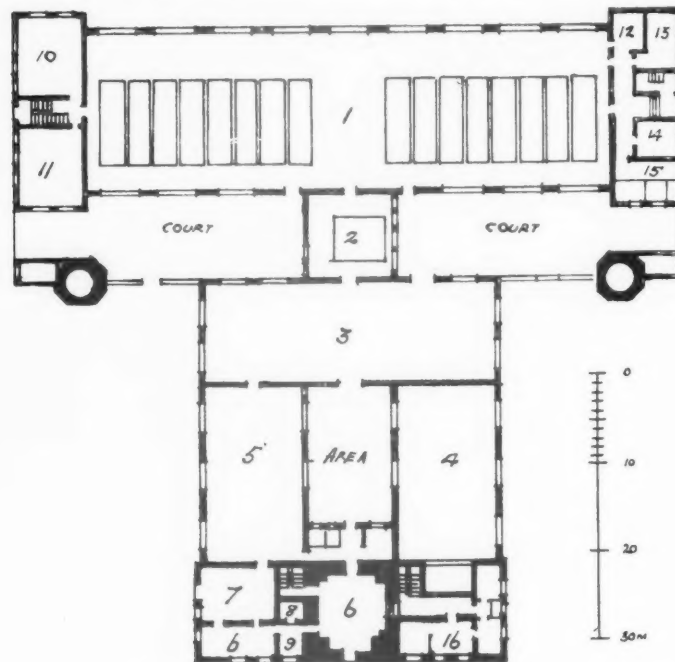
GROUND FLOOR PLAN OF THE BOILER AND ENGINE HOUSE BLOCK, THE VIRCHOW HOSPITAL, BERLIN.
